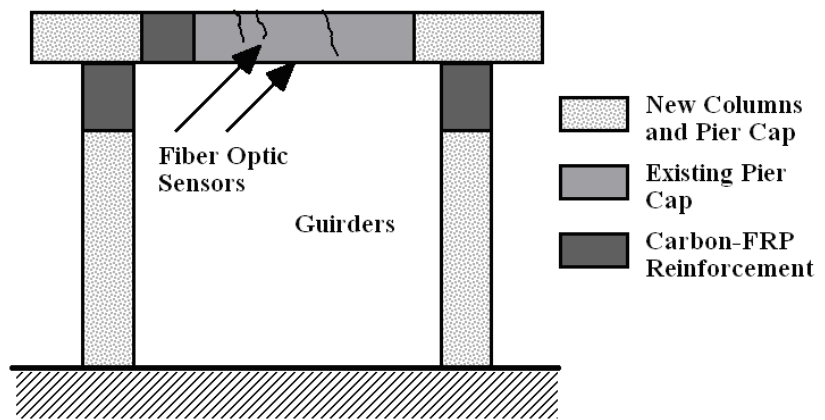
Schematic of the piers and pier cap of an instrumented concrete bridge. Fiber optics sensors monitor cracks in concrete and delamination of FRP reinforcement.
